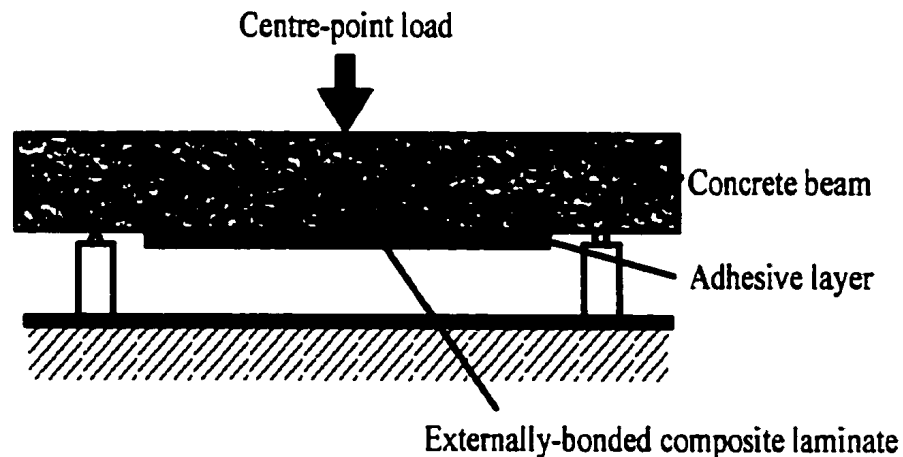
Rectangular concrete beam strengthened by externally-bonded composite laminate onto the beam tension surface.
